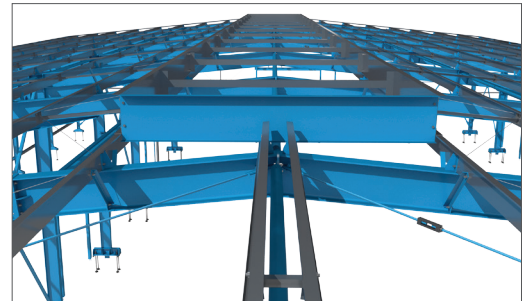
Structural arrangement of a skylight frame straight front in the roof ridge
